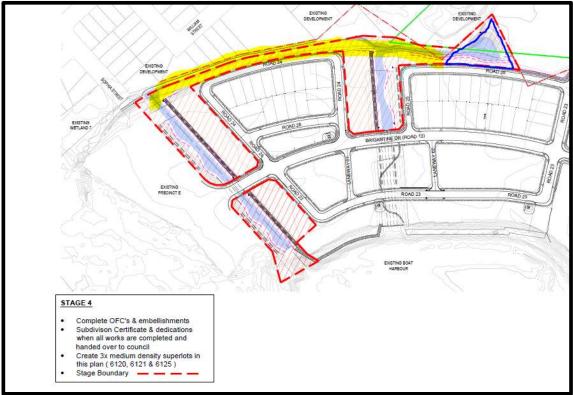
Extract from Staging plan 4- indicates landscape works to be undertaken and triangular area with blue outline = to be landscaped further to separate DA regarding management of contaminated fill. Source: Plans
